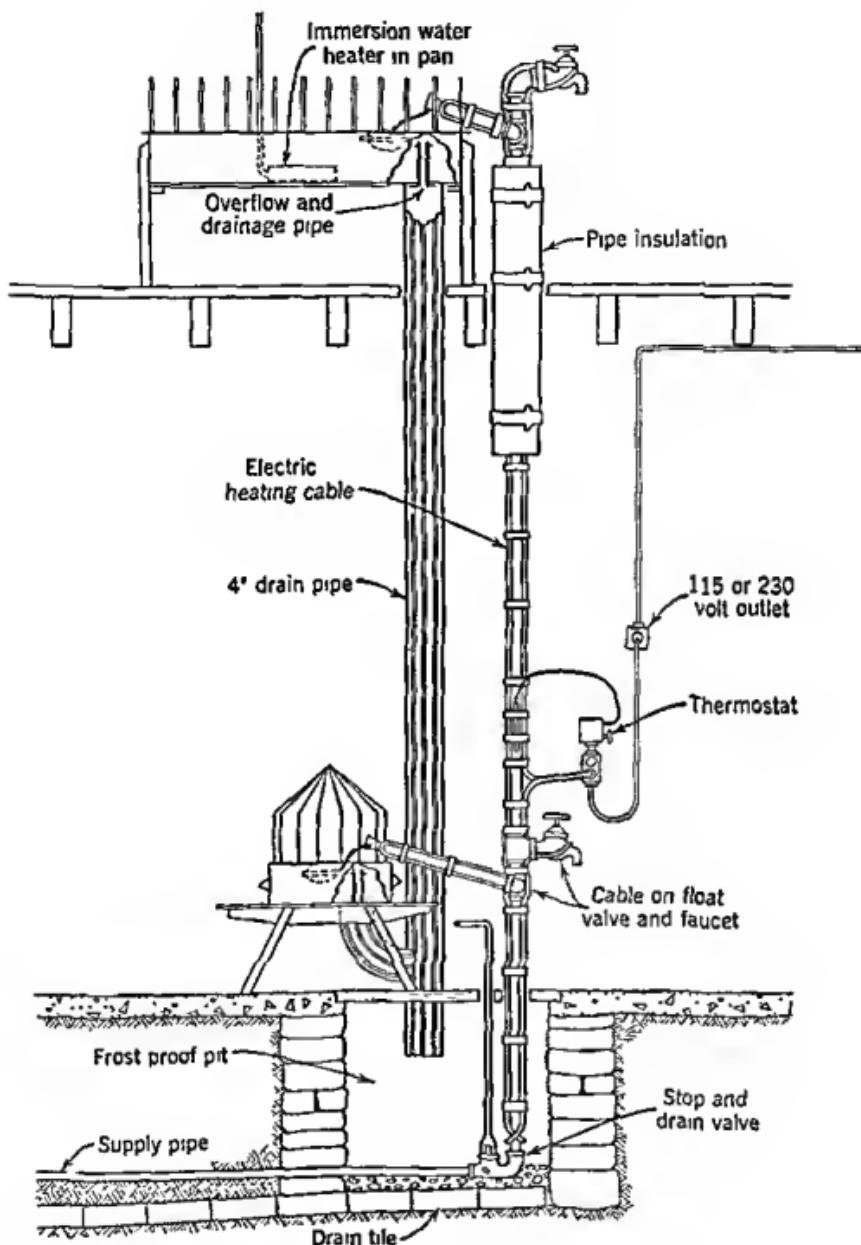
Heating-cable installation and drainage system Courtesy Cornell University.
